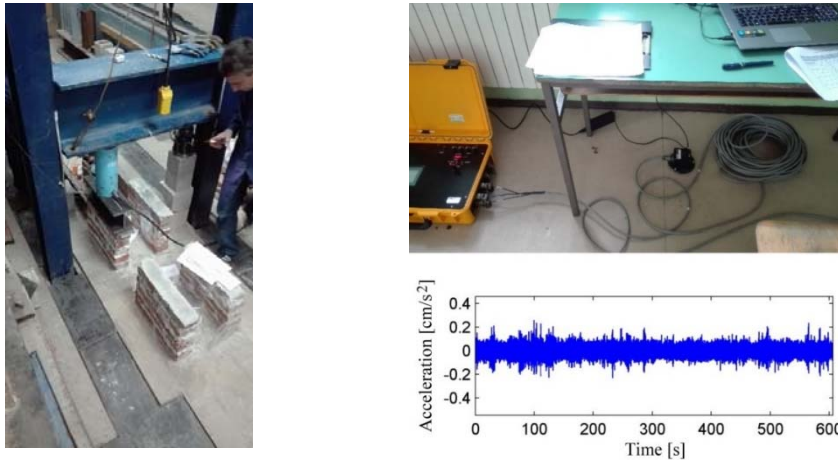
Testing of wallets compressive strength (left) and testing equipment and typical acceleration signal in selected building location (right)
